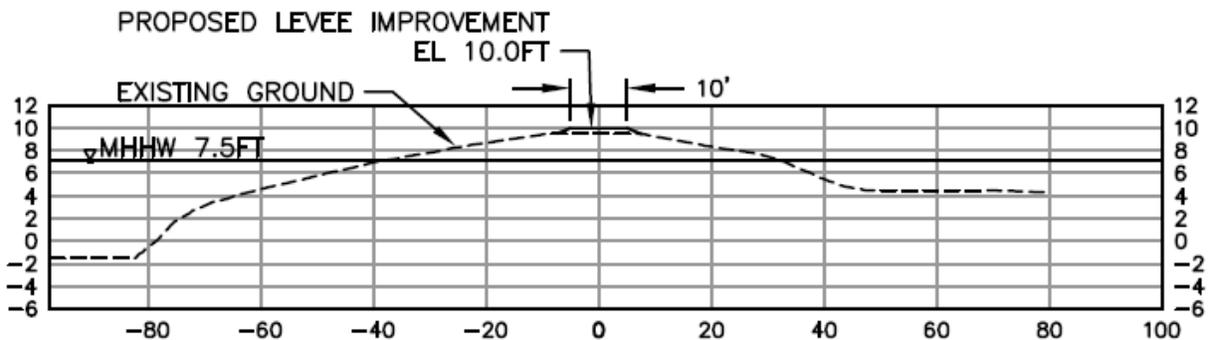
Proposed Pond A1 West Levee Improvement – Typical Section.
